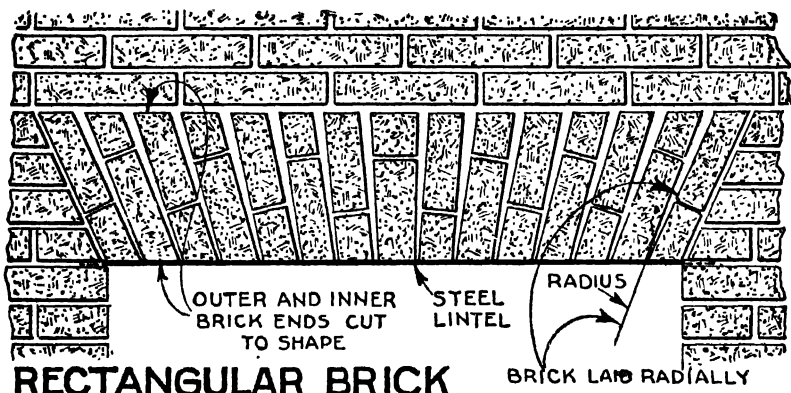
,303.—Flat arch with *standard brick*, an inexpensive type of arch, the bricks are not wedge shape, mortar being used to fill the converging joints. The thick end forming the extrados and intrados should be shaped so as to lie in horizontal places.
